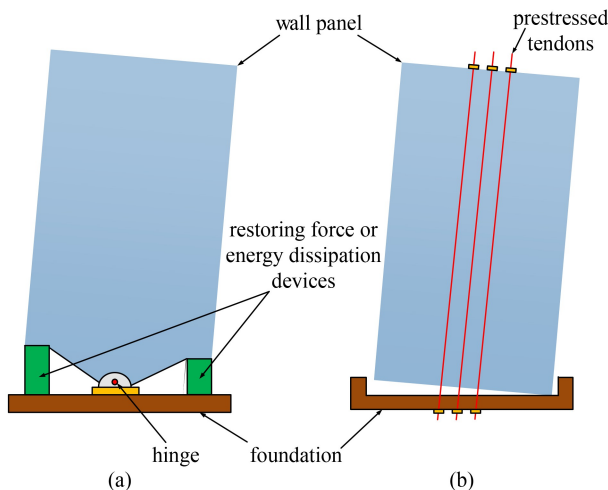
Reinforced concrete rocking walls: (a) pin-supported rocking wall; (b) stepping rocking wall.
